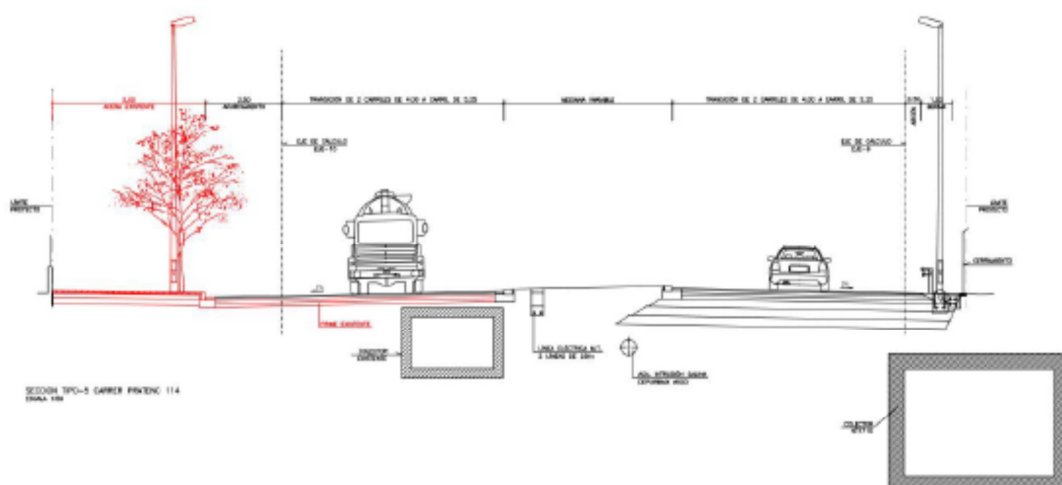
Existing cross-section of the road connection (source: Esteyco)
